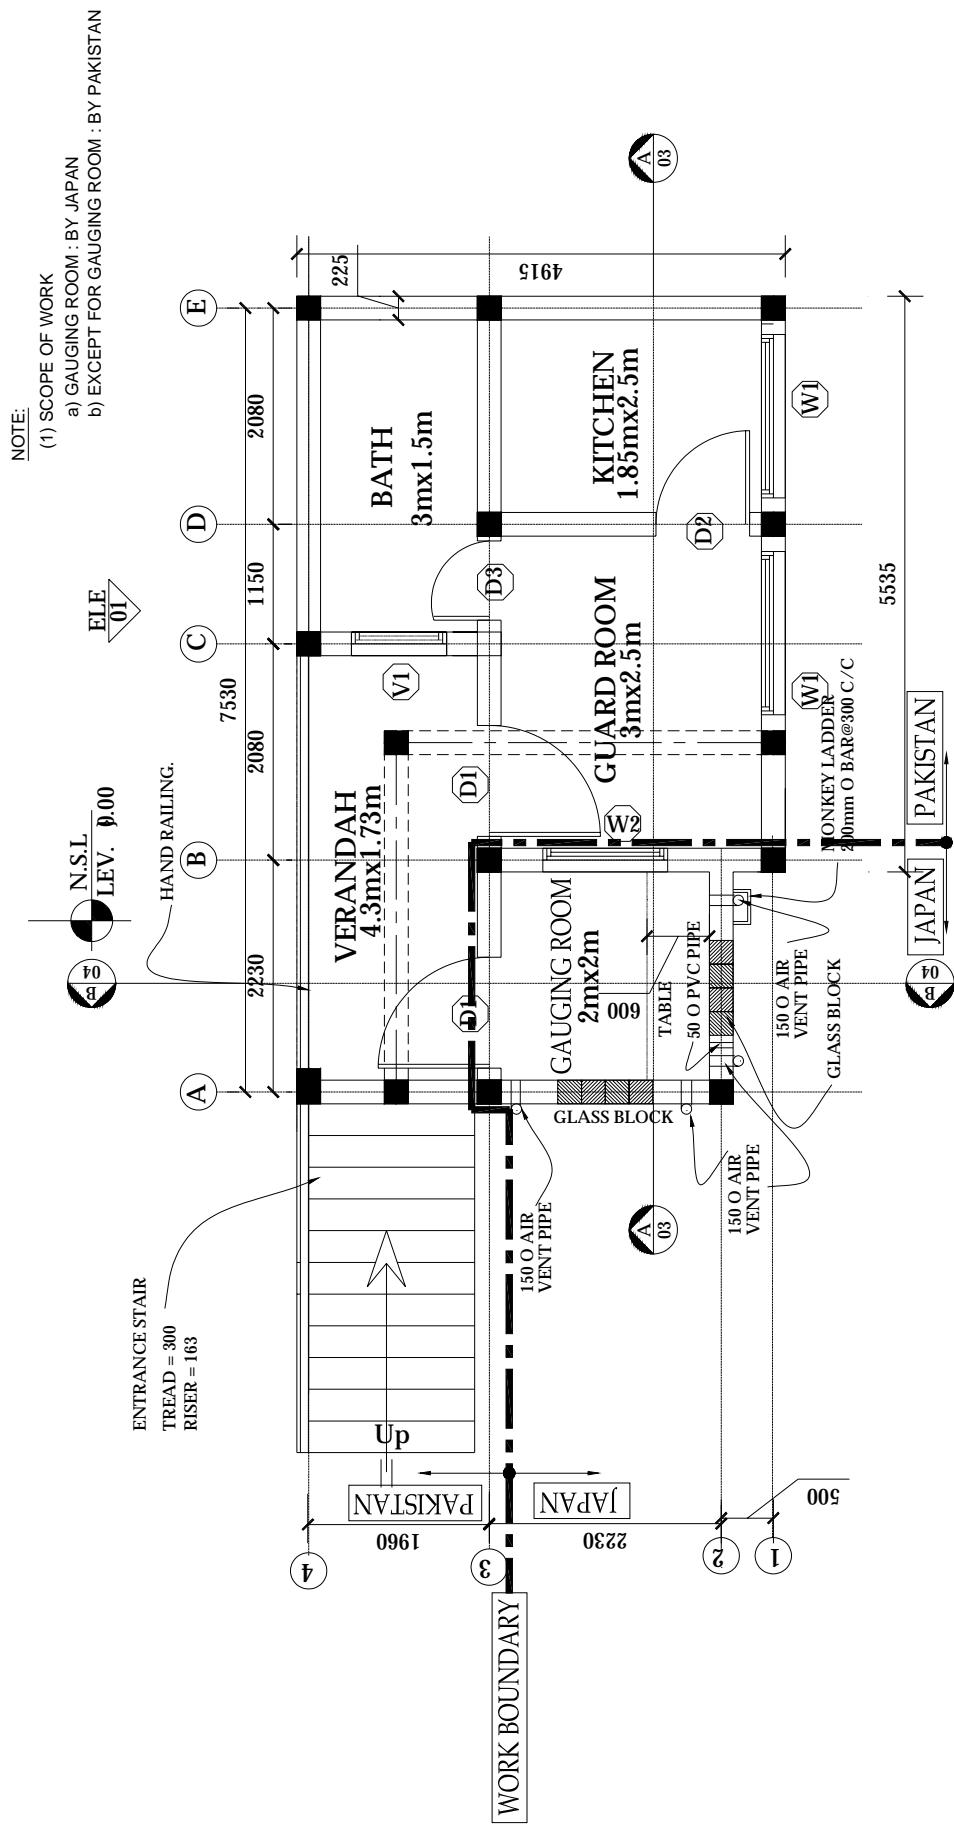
Layout Plan of Rainfall Gauging Station (Golra)
